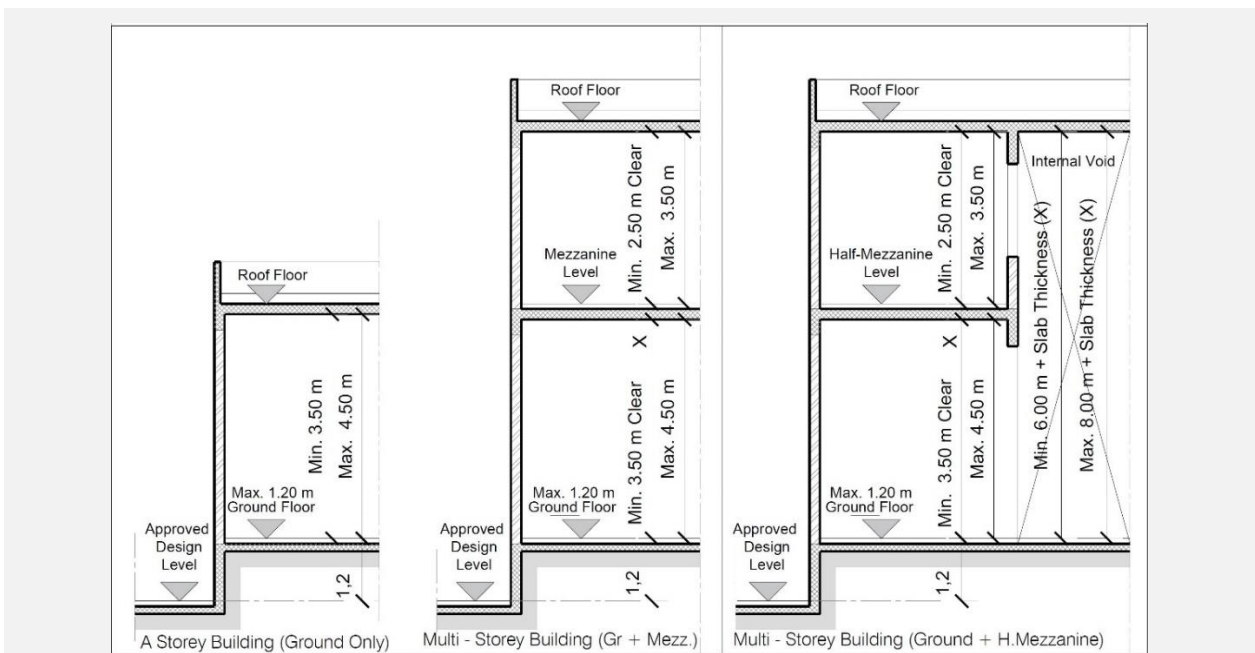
Net Interior Height of Story/ Multi-storey Buildings Typical Floor (for Commercial and Office Uses)
